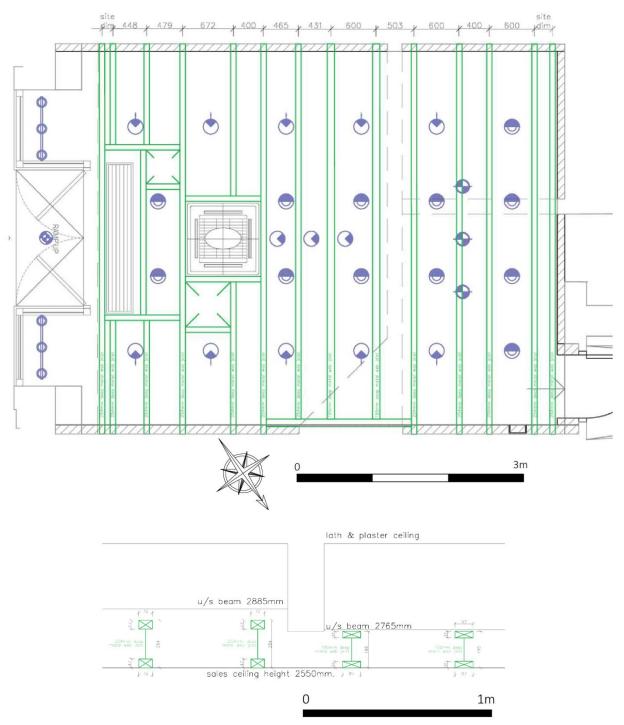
Proposed ceiling, plan and section (scale 1:50 & 1:20)
